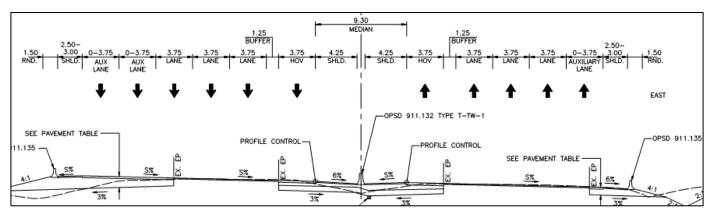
Typical Profile - Final Highway 427 Profile (Finch Avenue to Steeles Avenue)
